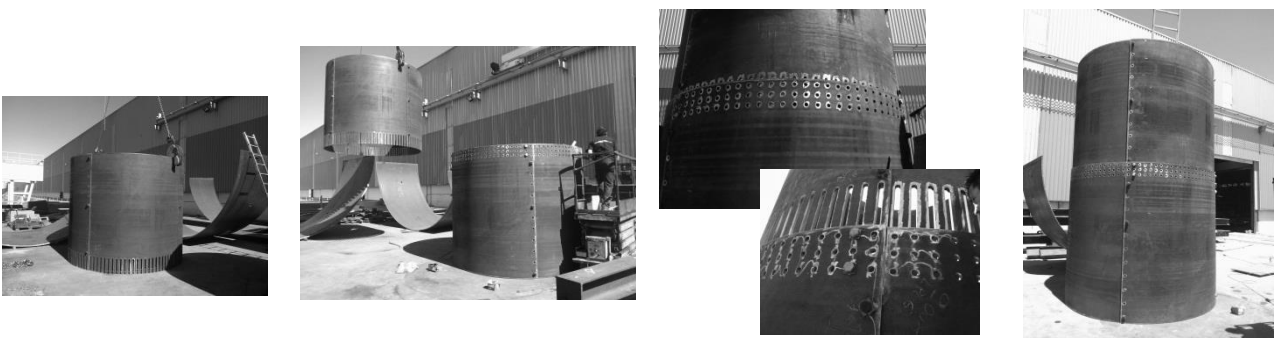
Final assembly of both segments (20mm thick connection)
